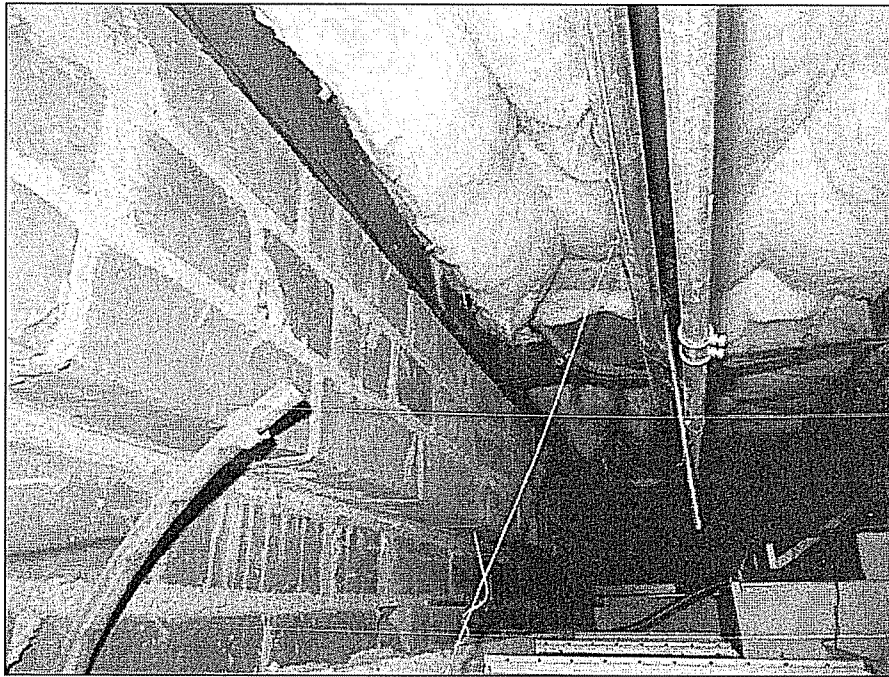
Strap Connecting Wood Framing to Brick Wall
